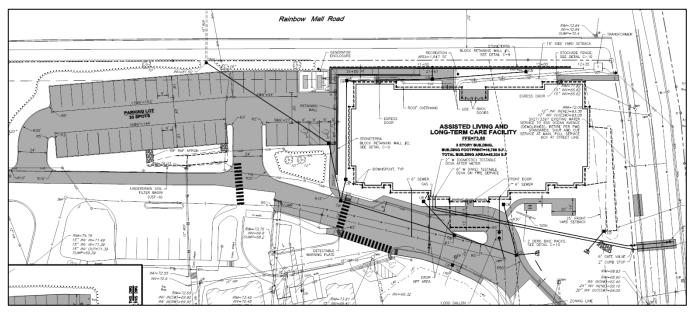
Proposed site plan showing parking lot reconfiguration, utility connections and pedestrian infrastructure improvements
